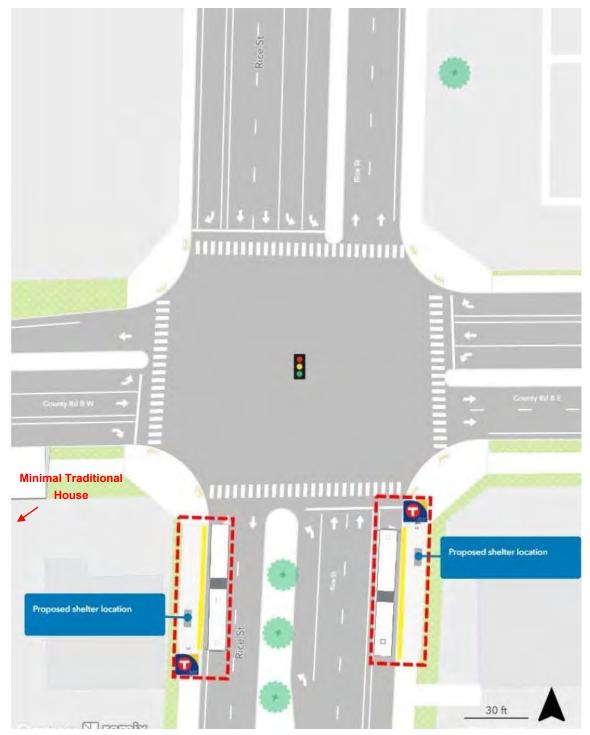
Rice Street County Road B Station Concept Plan in area of the Minimal Traditional House.
